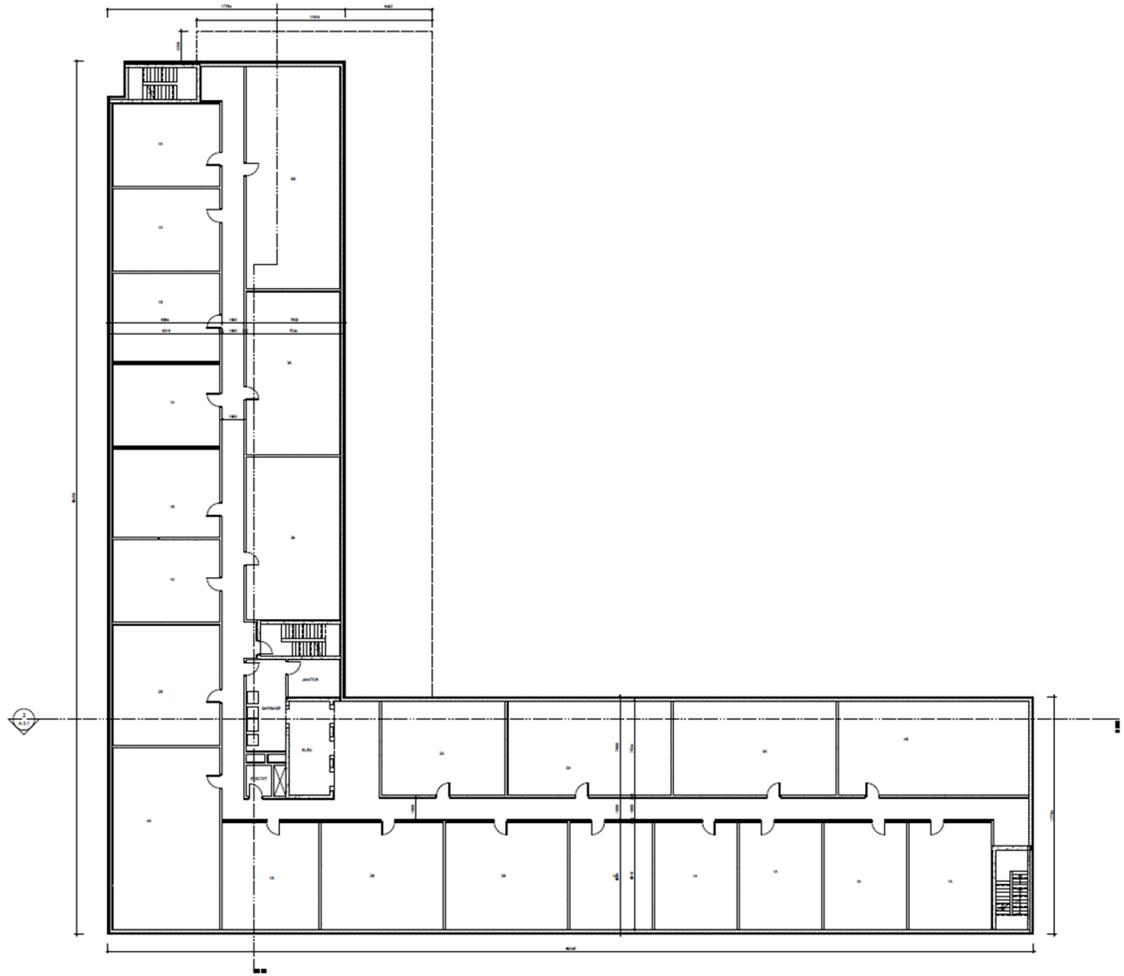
2nd to 5th Storey Floor Plan prepared by IBI Group
